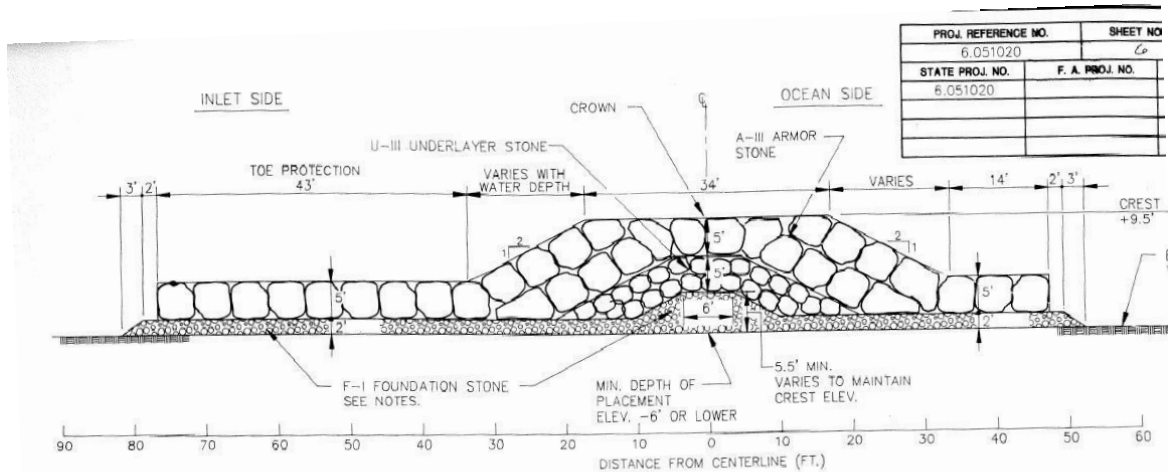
Oregon Inlet Terminal Groin Typical Cross-Section
